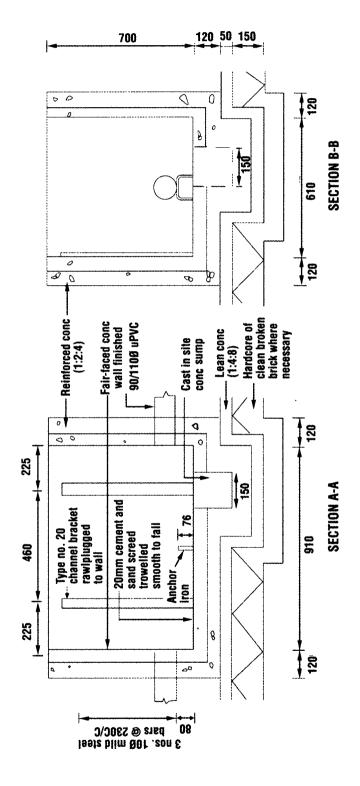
MANHOLE DRAWINGS - TYPE MX1
